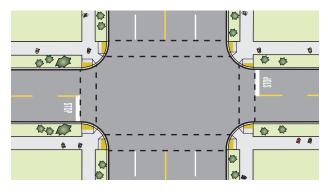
All legs of all street intersections are crosswalks, regardless of the presence of sidewalks, shoulder or other "pedestrian" facility
